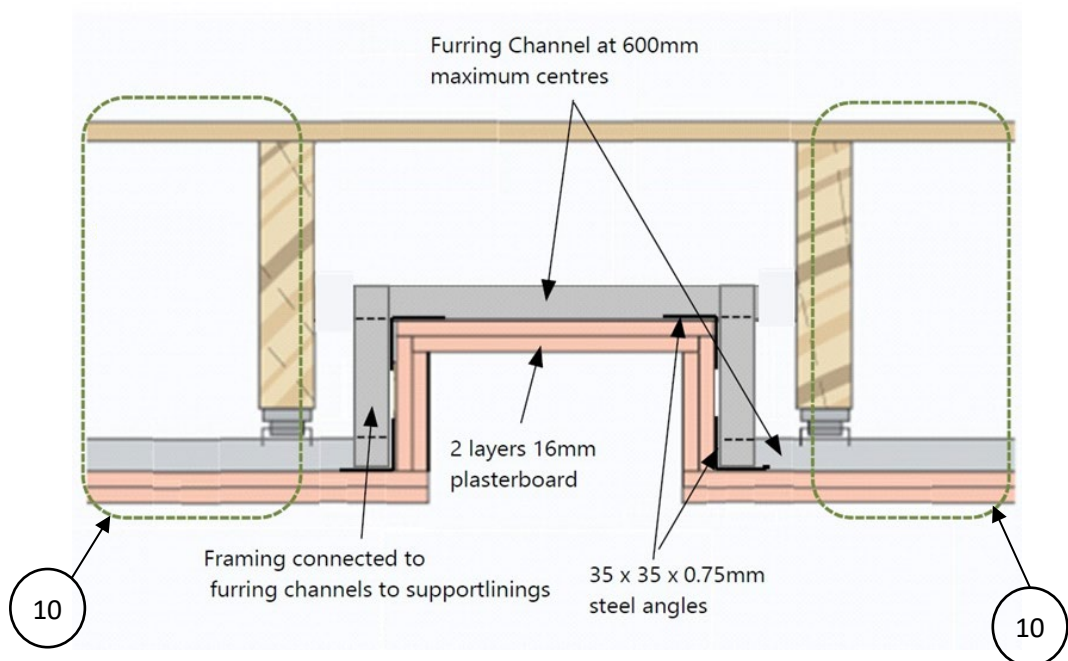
Framing out detail for large rebated ceiling opening – Plan view
